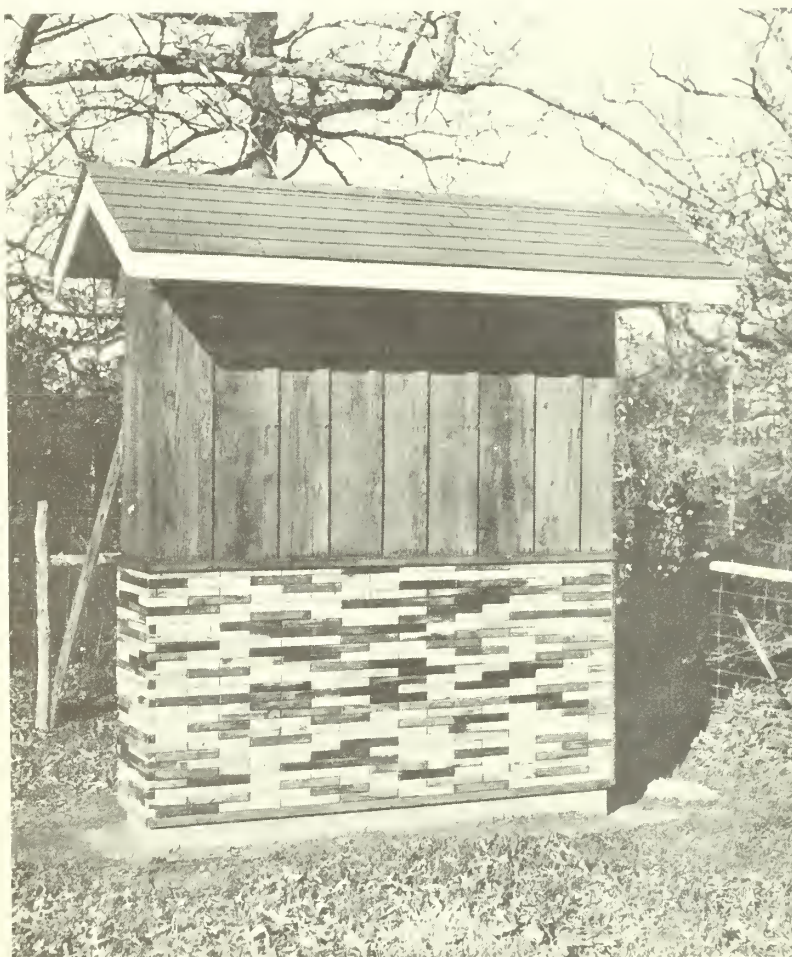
Wall section to test wooden brick for use as exterior wainscoting. The brick can be multicolored, as shown, or uniform in color.
